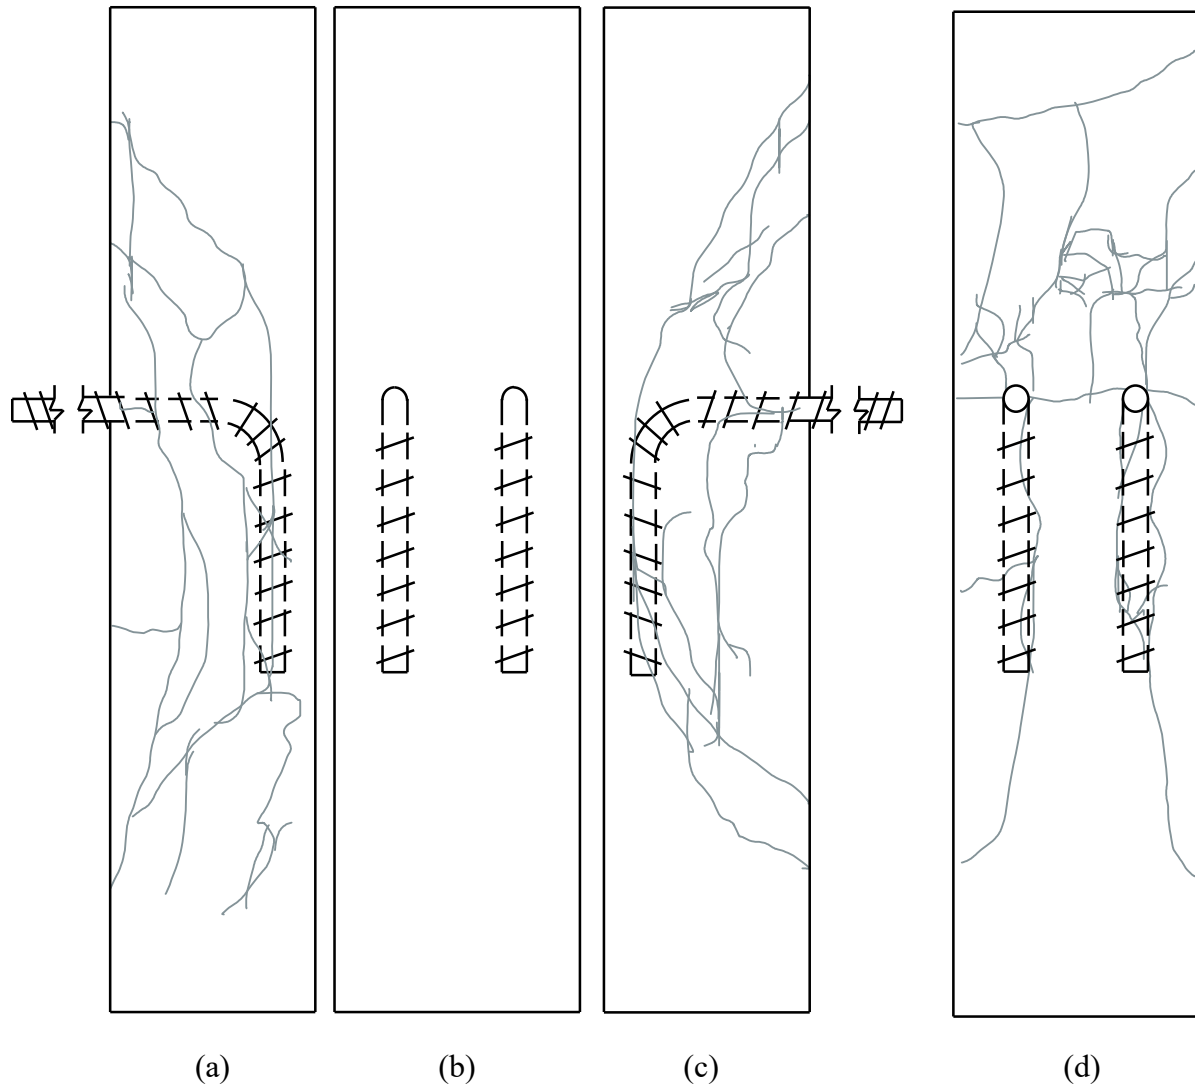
Crack pattern at maximum normalized tensile load for beam-column joint specimen MD2-90 which was deemed an outlier: (a) west side face, (b) back face, (c) east side face, and (d) front face
